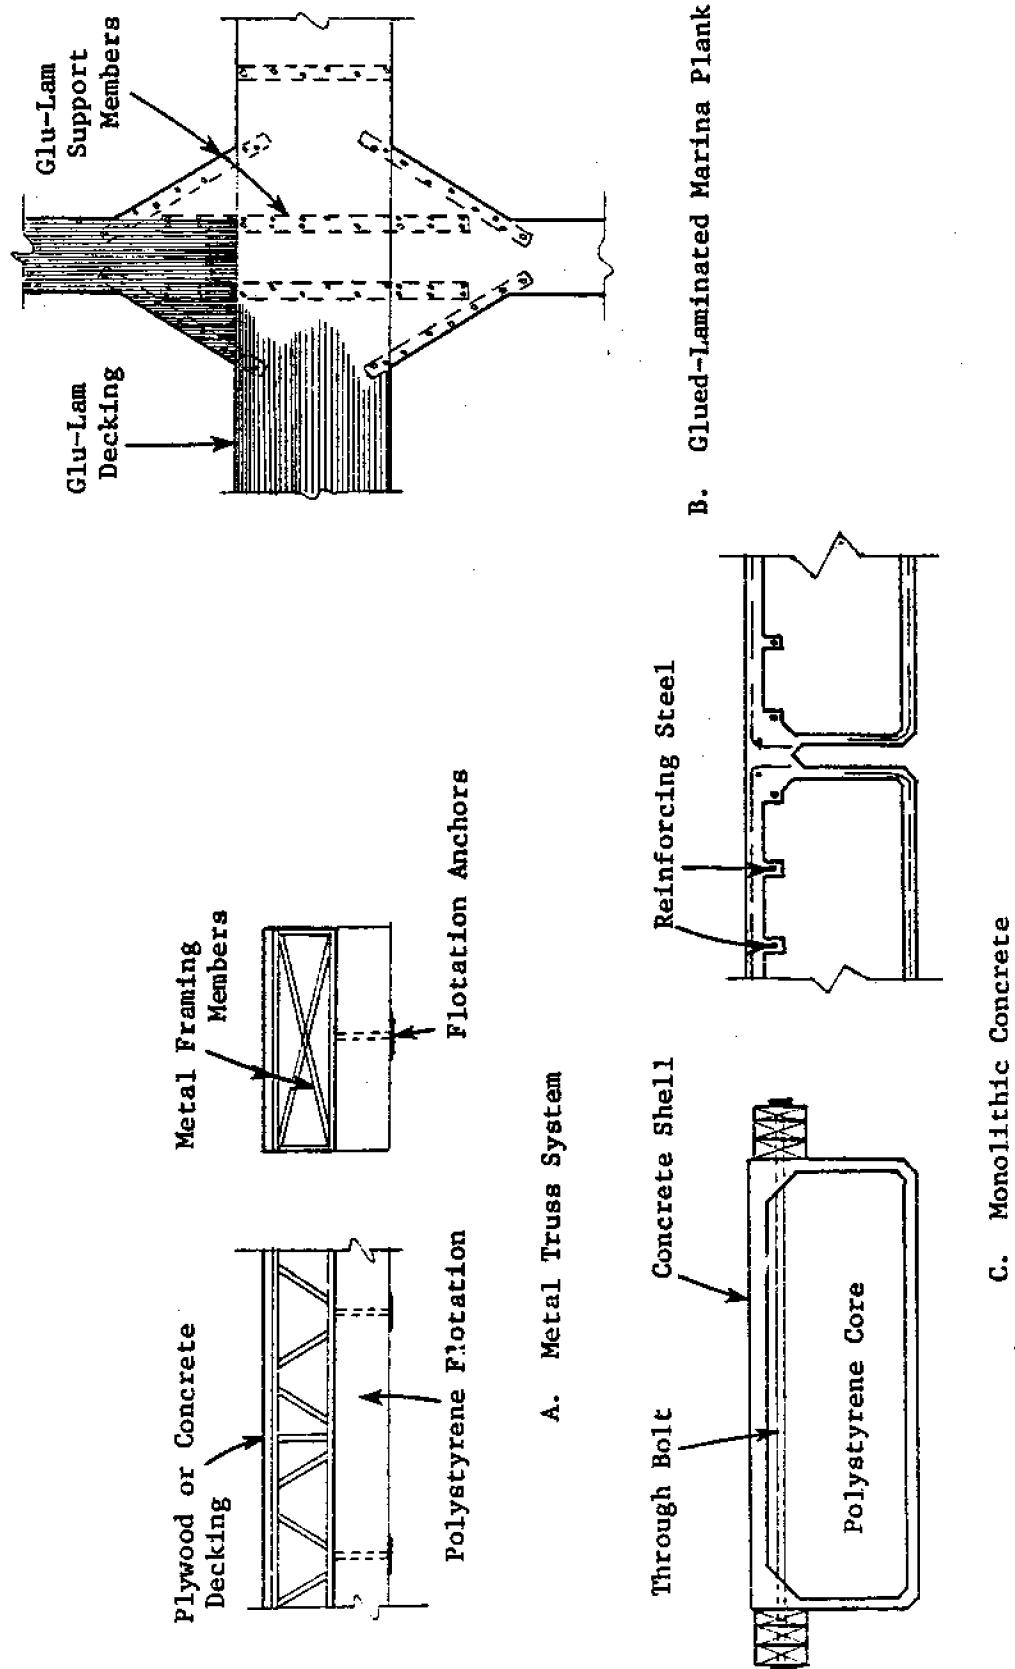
Floating Dock Structural Types (After Winzler and Kelly, 1979, V-5, V-32, VI-4)
